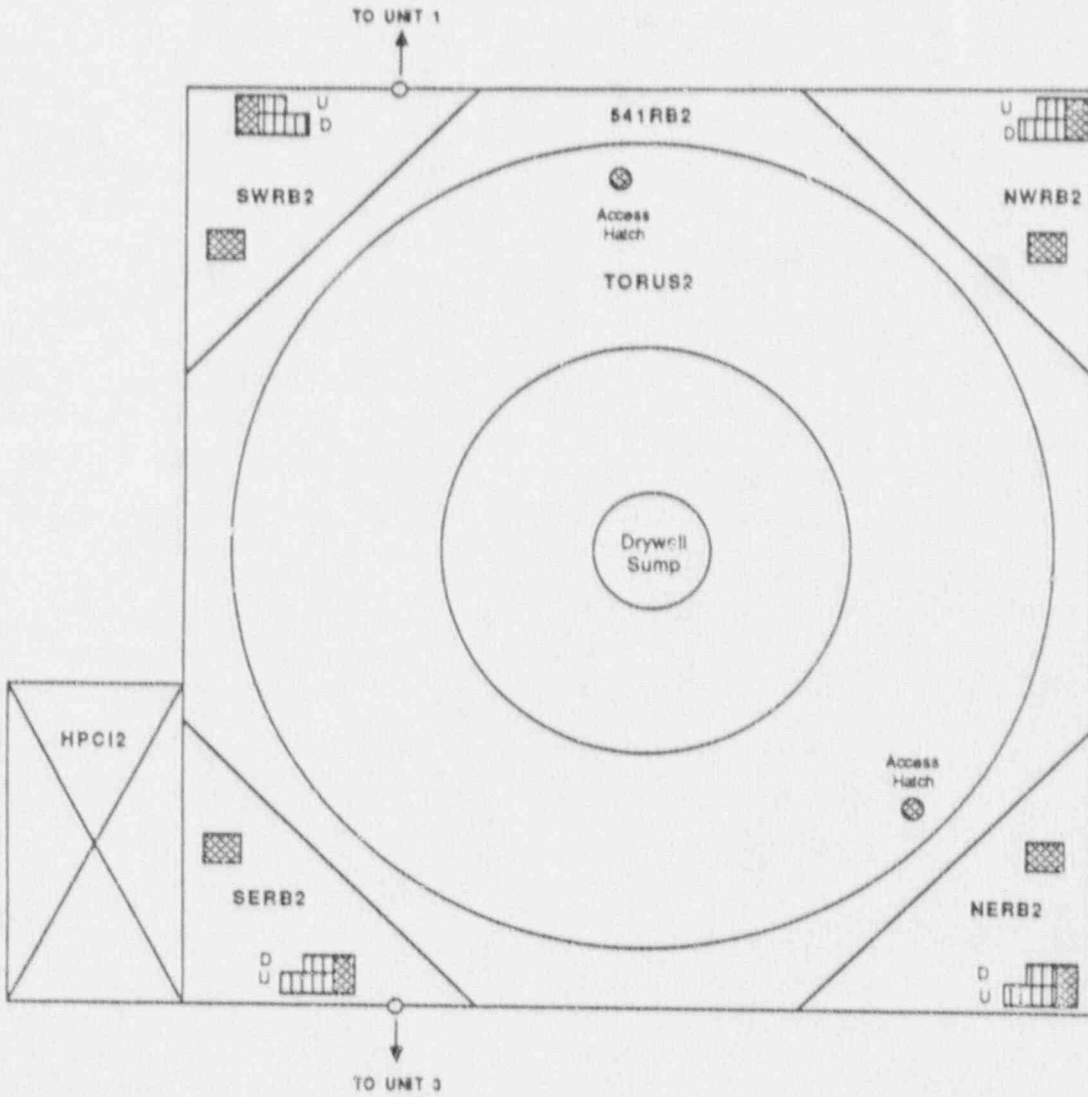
Browns Ferry Unit 2 Reactor Building - 541.5 ft. Elevation.
